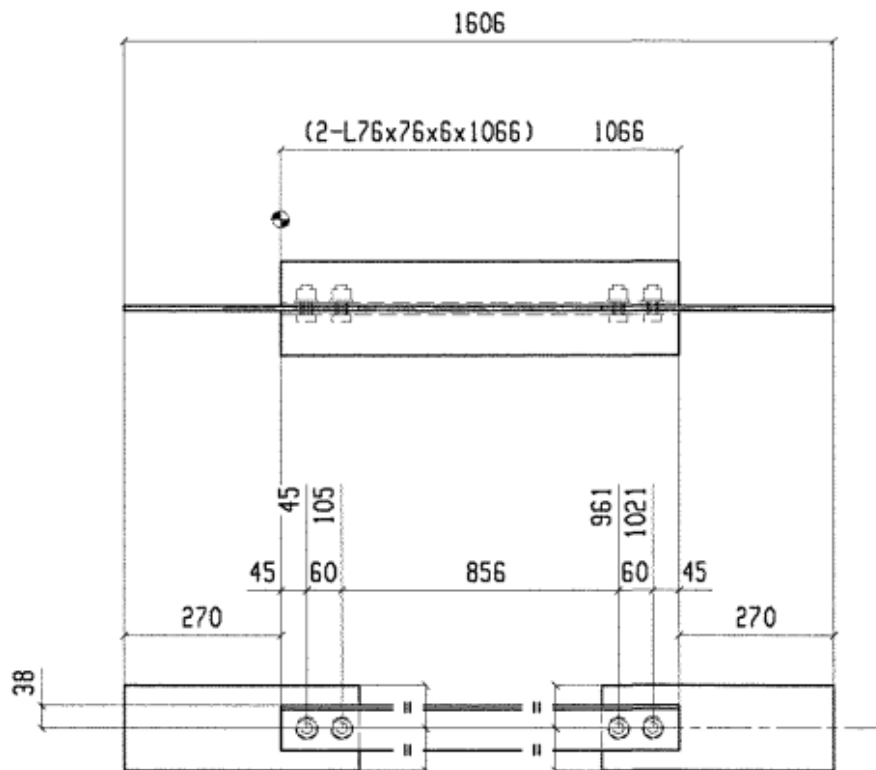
Specimen D03X (bolt bearing failure of gusset plate).
